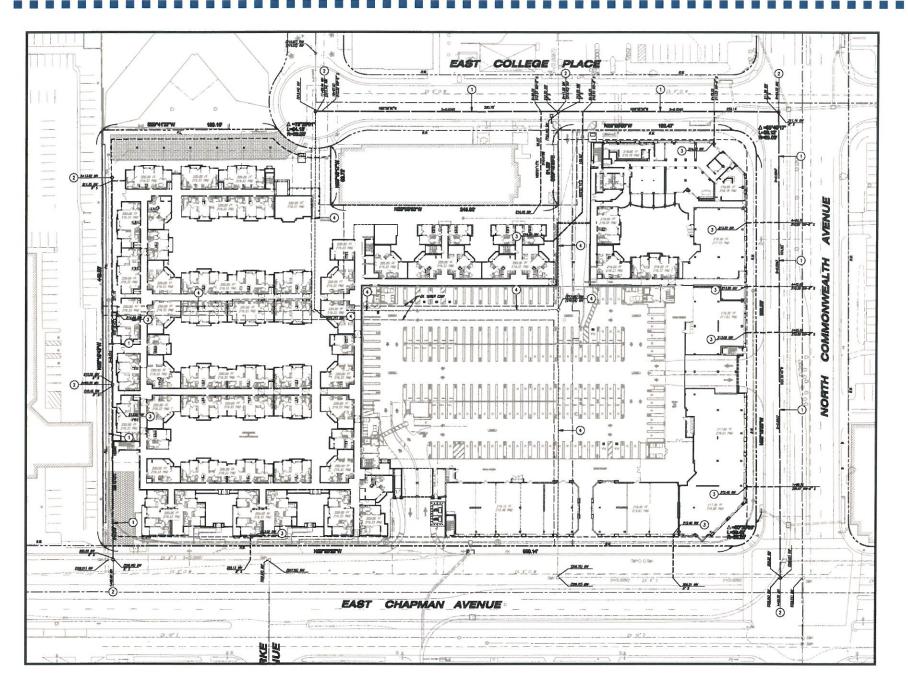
Conceptual Sewer Facilities Improvements Plan
